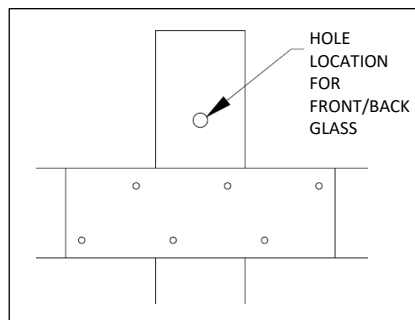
FIG. B – FRONT / BACK GLASS ANCHOR LOCATION
